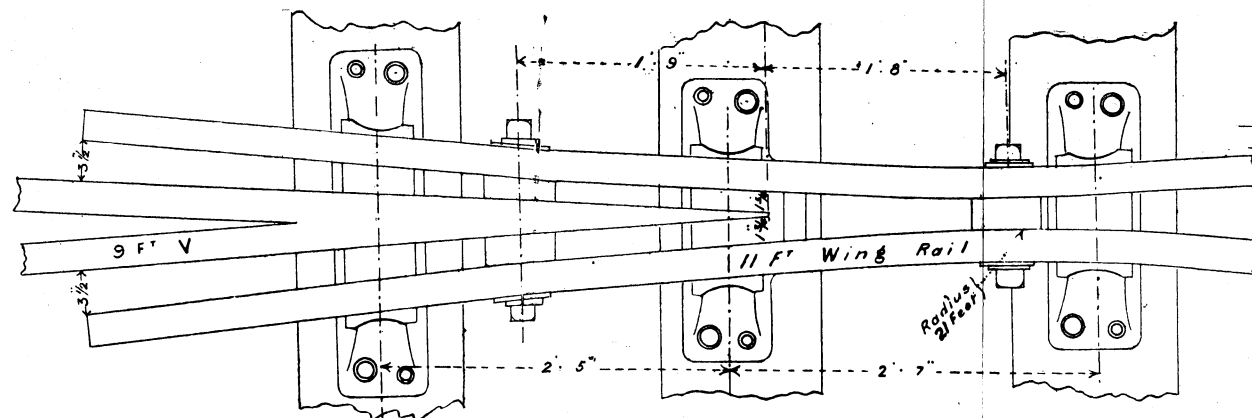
ENLARGED PLAN SHEWING POSITION OF BLOCKS IN 1 IN 8 CROSSING
